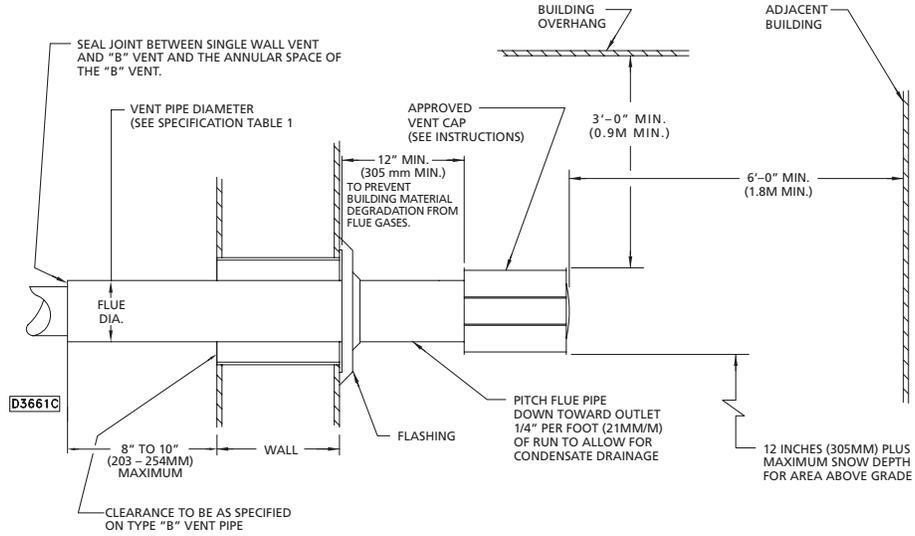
A – Horizontal Arrangement – Single Wall Vent System to Double Wall Termination
